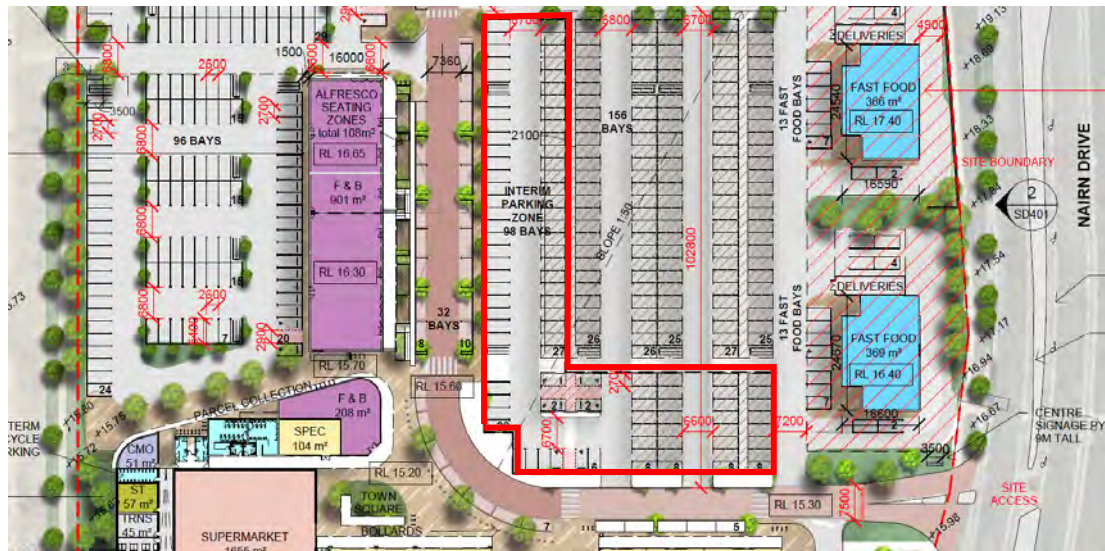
Excerpt from Development Plans (Interim Parking Bays)
